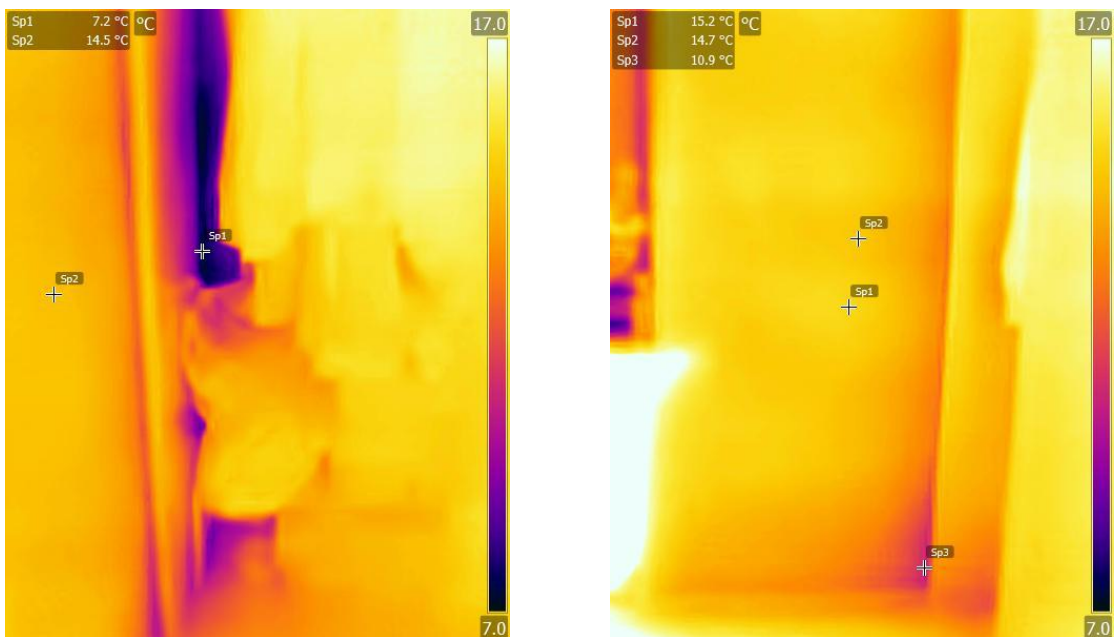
Exterior walls of Stalinist brick apartment buildings (and other buildings with similar mass masonry walls) have poor hygrothermal performance. Here a problematic corner detail of a building in HeriTACE project exhibits recurring mould growth. Sp1 of left thermogram shows surface temperature of the corner that also happens to be behind a cupboard resulting in a very low temperature factor of $f_{Rsi} = 0.34$. (See deliverable D2.1)
